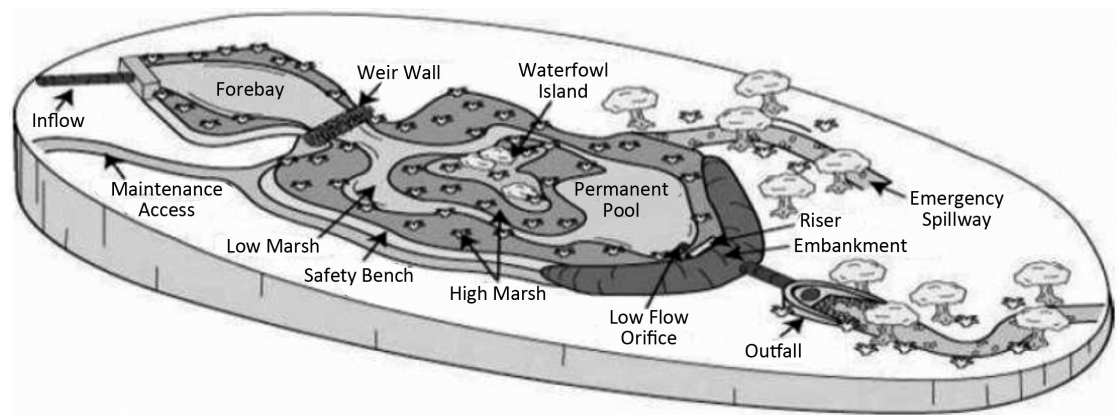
Sample constructed wetlands plan by the Virginia Department of Conservation and Recreation (VA-DCR; 2011).
